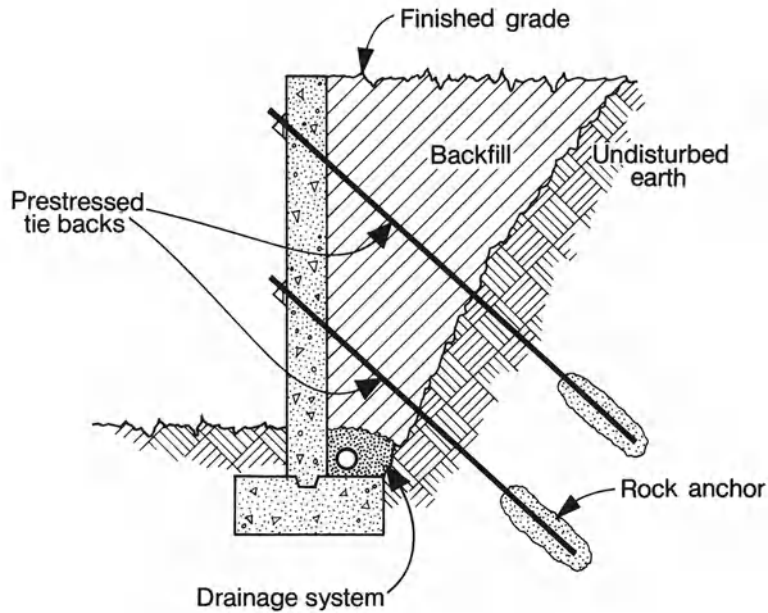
Retaining walls with prestressed tiebacks.
